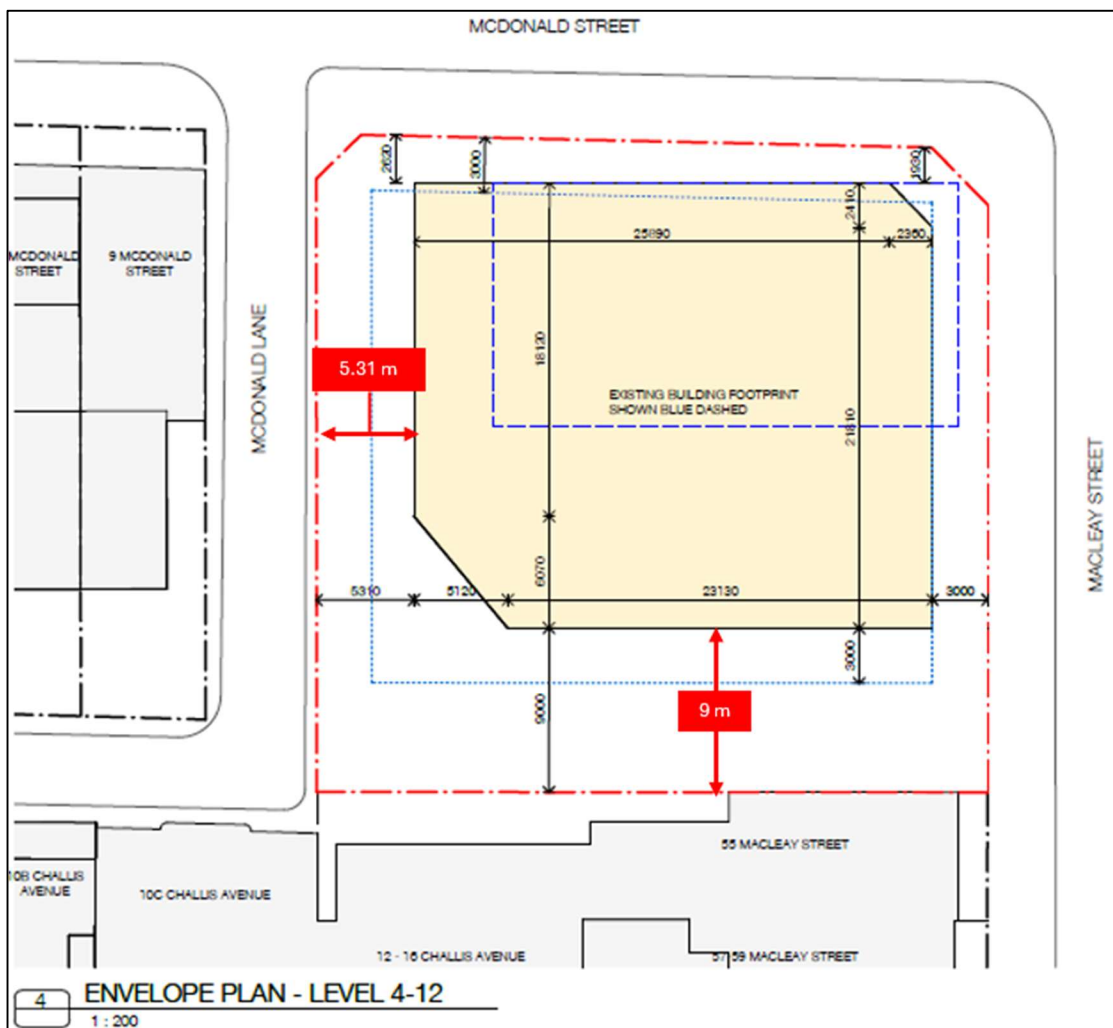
| Building envelope upper-level floor plan and separation distances (Source: Applicant's EIS)
